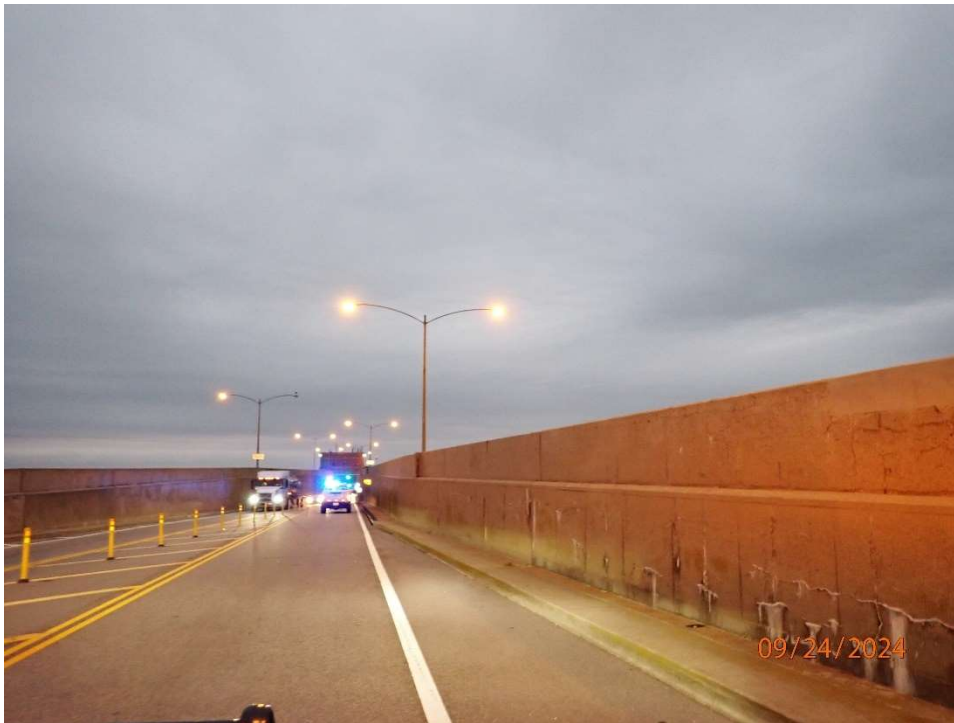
Portal Island 3 Approach Roadway and Approach Wall; vertical and transverse cracks in approach wall with efflorescence.
